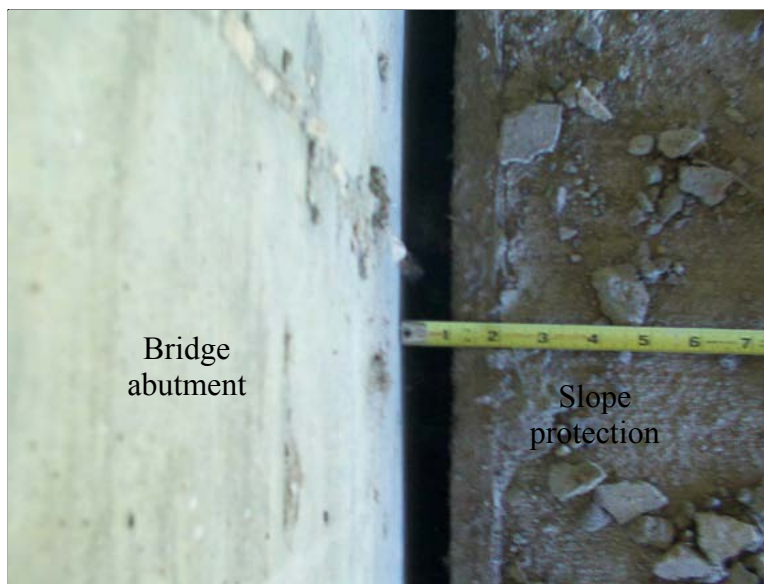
Top view showing the 1 in. gap between the abutment and concrete slope cover (South end of NBL)
